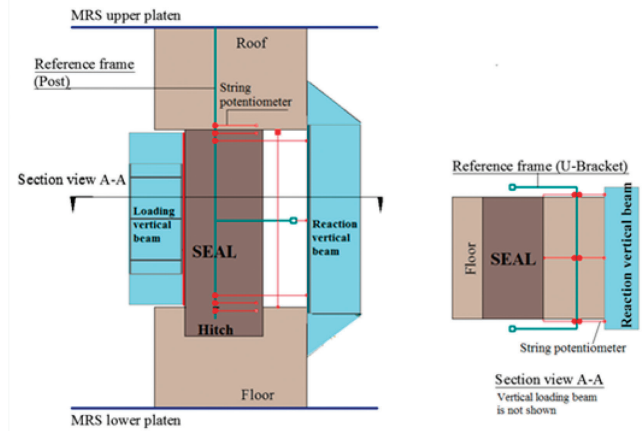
Side-view (left) and top-view (right) illustrations of test specimen and MRS seal testing fixture showing displacement measurement system (not to scale).
